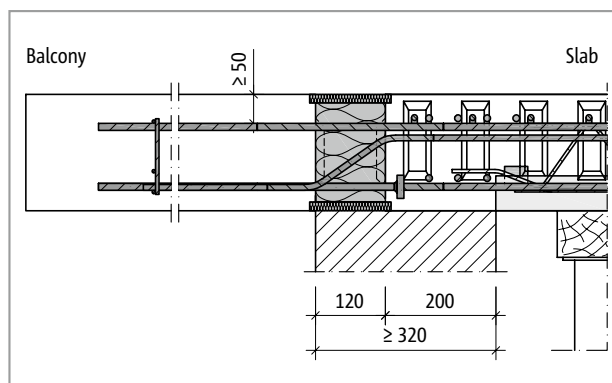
Schöck Isokorb® XT type C: Prefabricated slab with edge support with thermal insulating masonry (section XT type C-R-CV50, view XT type C-L-CV35)
